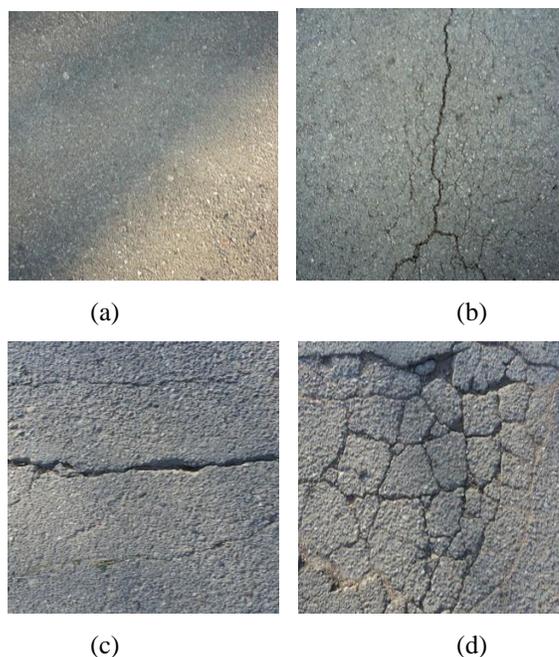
Different types of road surface cracks; a) Healthy pavement without cracks, b) Transverse crack, c) Longitudinal crack, d) Mesh type crack
